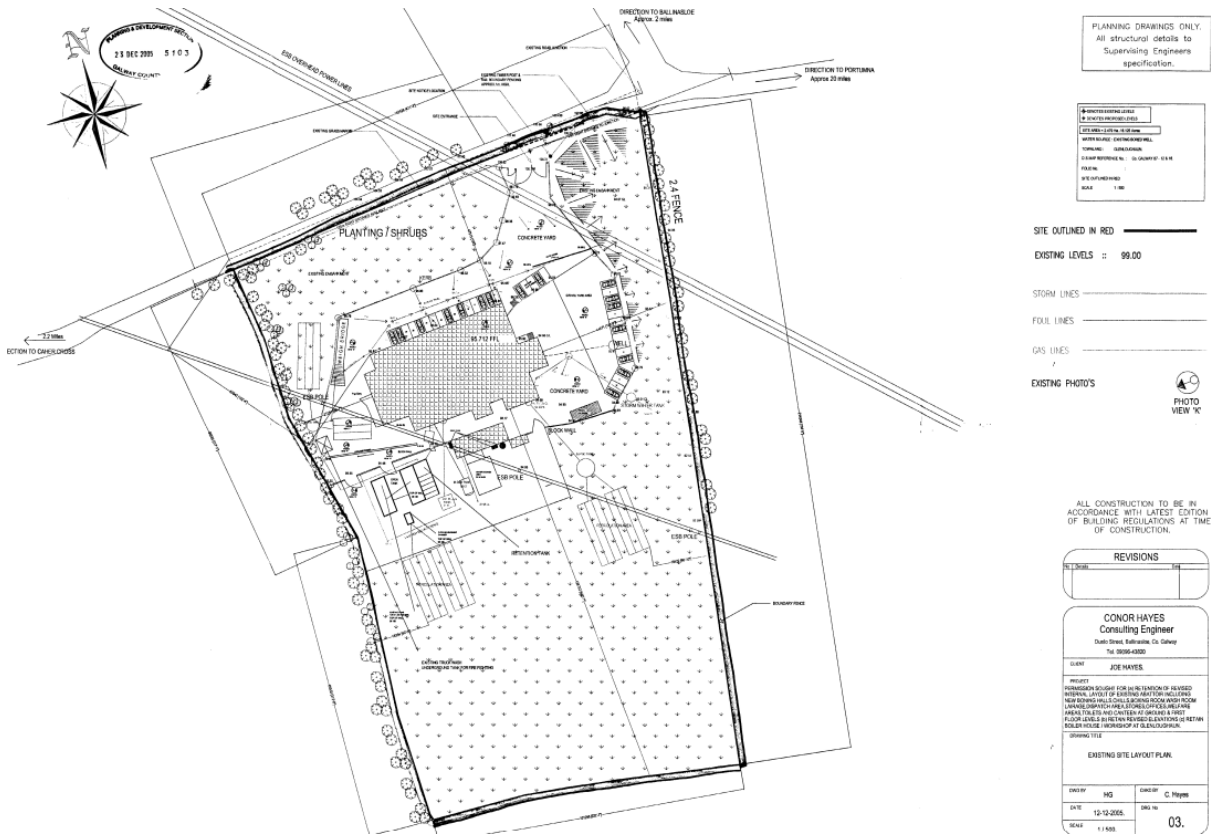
Extract from Existing Site Layout Plan, Reg. Ref.: 05/5103 [Source: Extract from Existing Site Layout Plan, Reg. Ref.: 05/5103]
